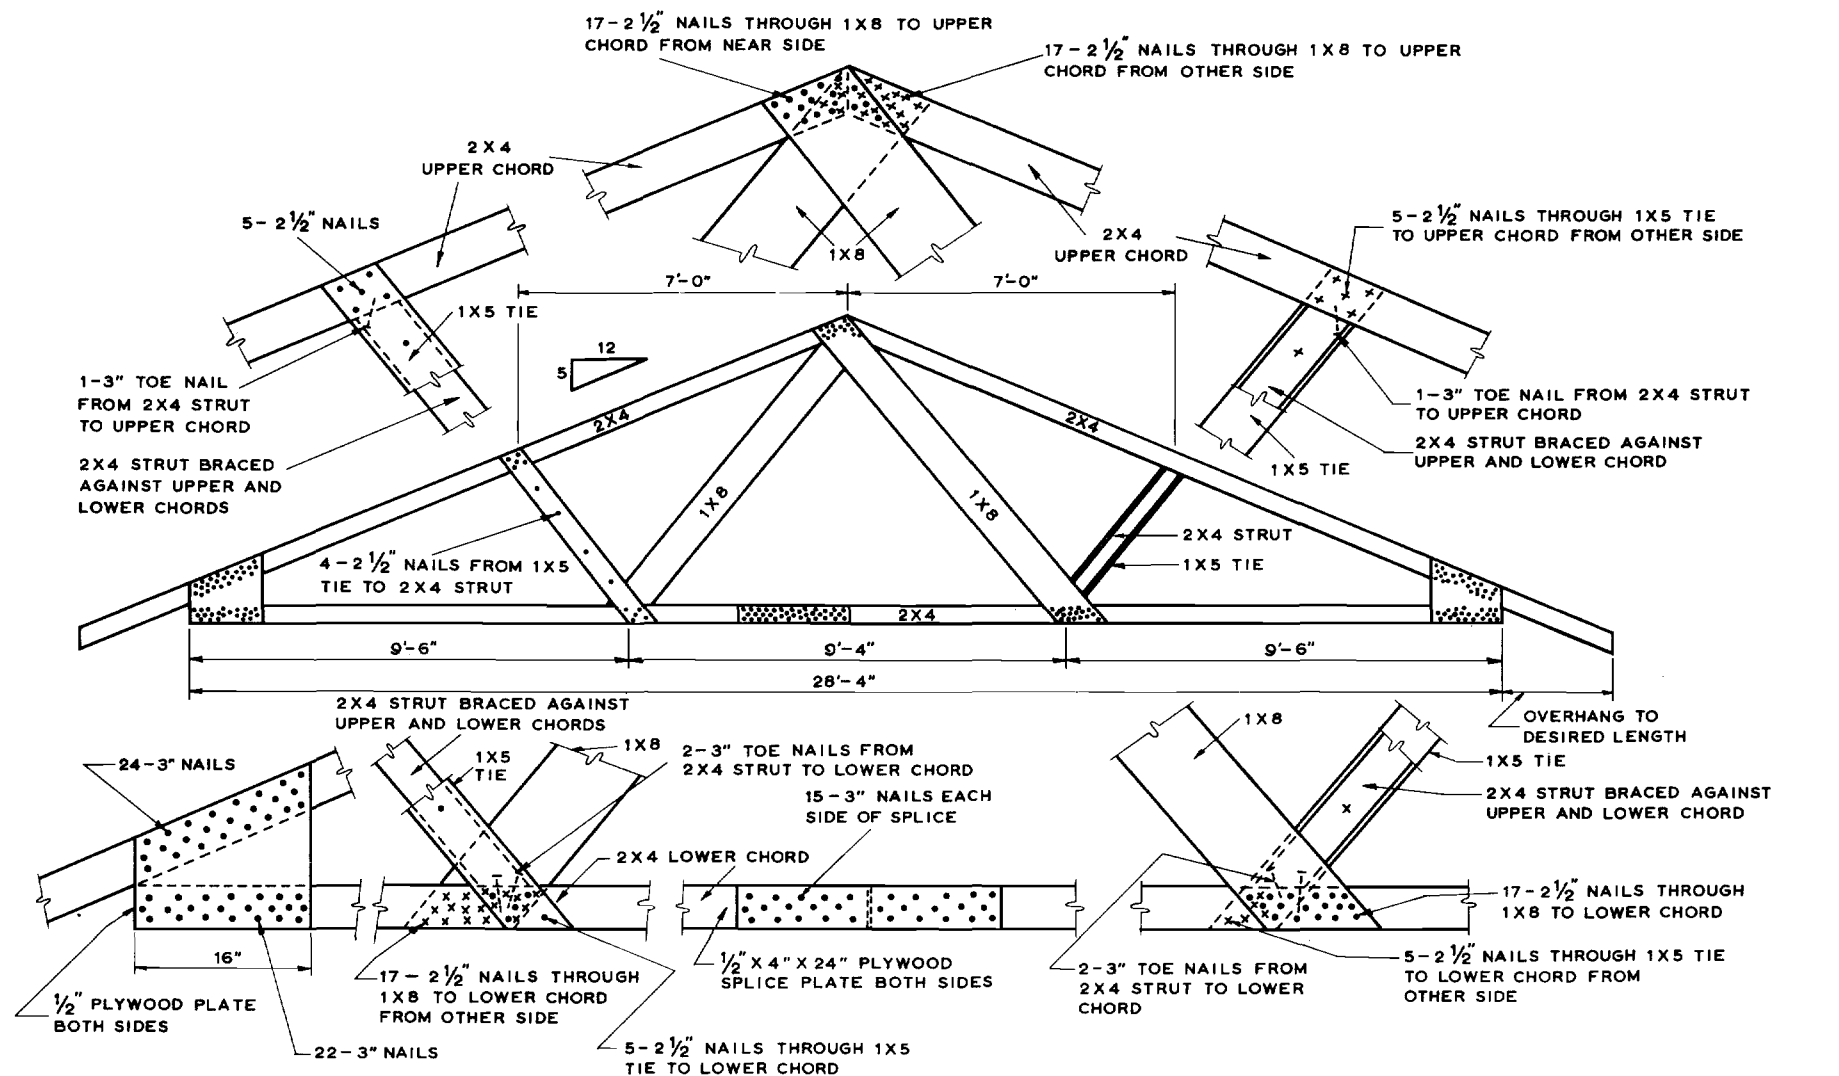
NAILED "W" TRUSS 26' SPAN $\frac{5}{12}$ SLOPE 2'-0" O.C.
